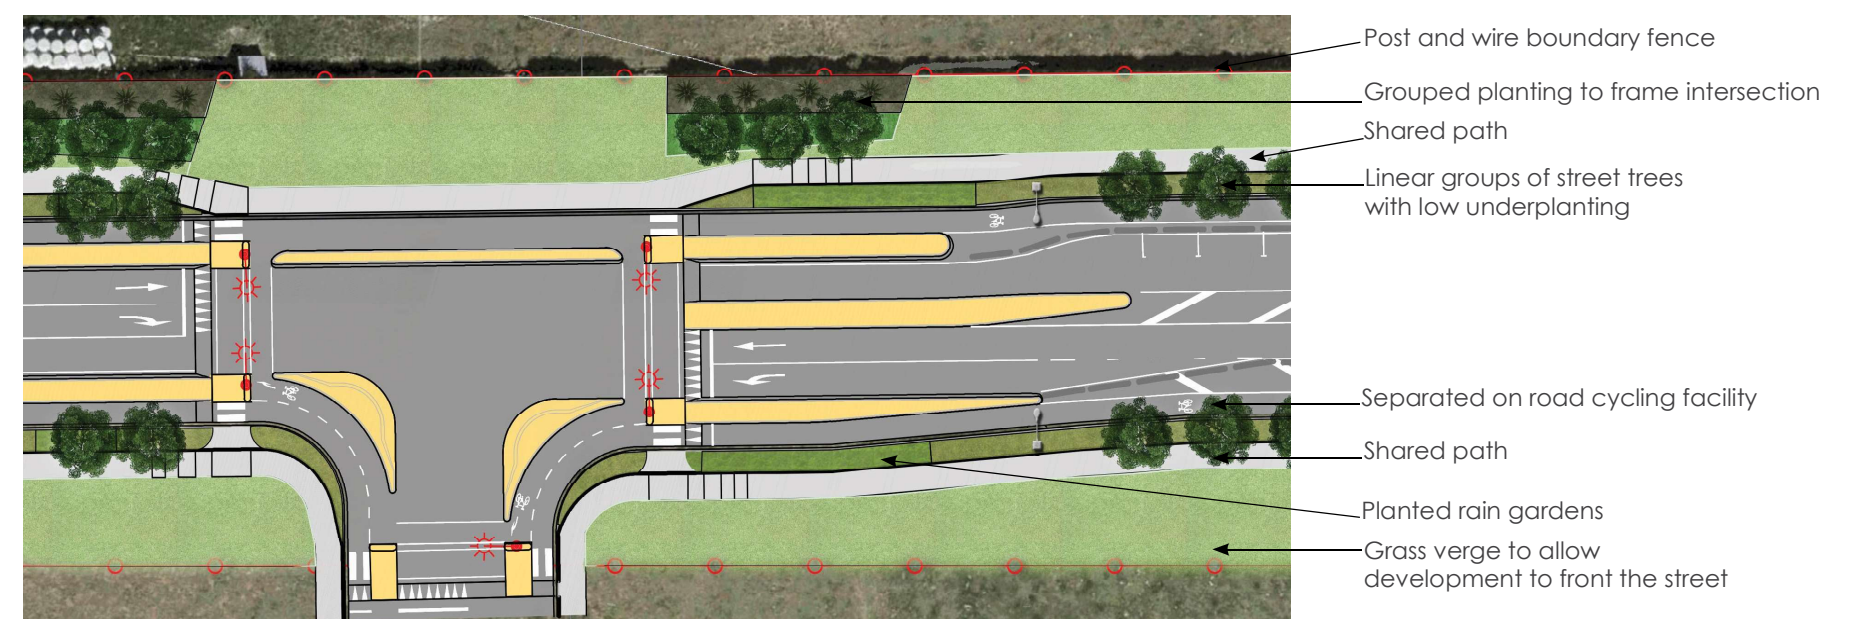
TYPICAL PEACOCKES ROAD STREETSCAPE
